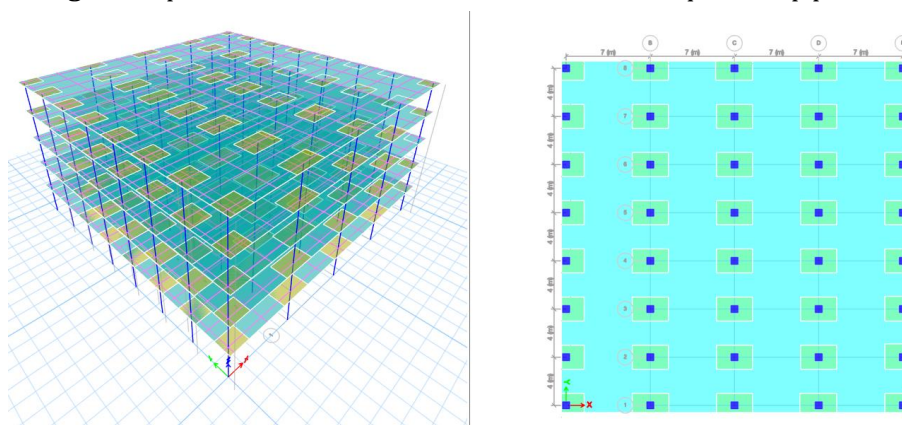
The plan and isometric view of the flat slab with rectangular drop panels
